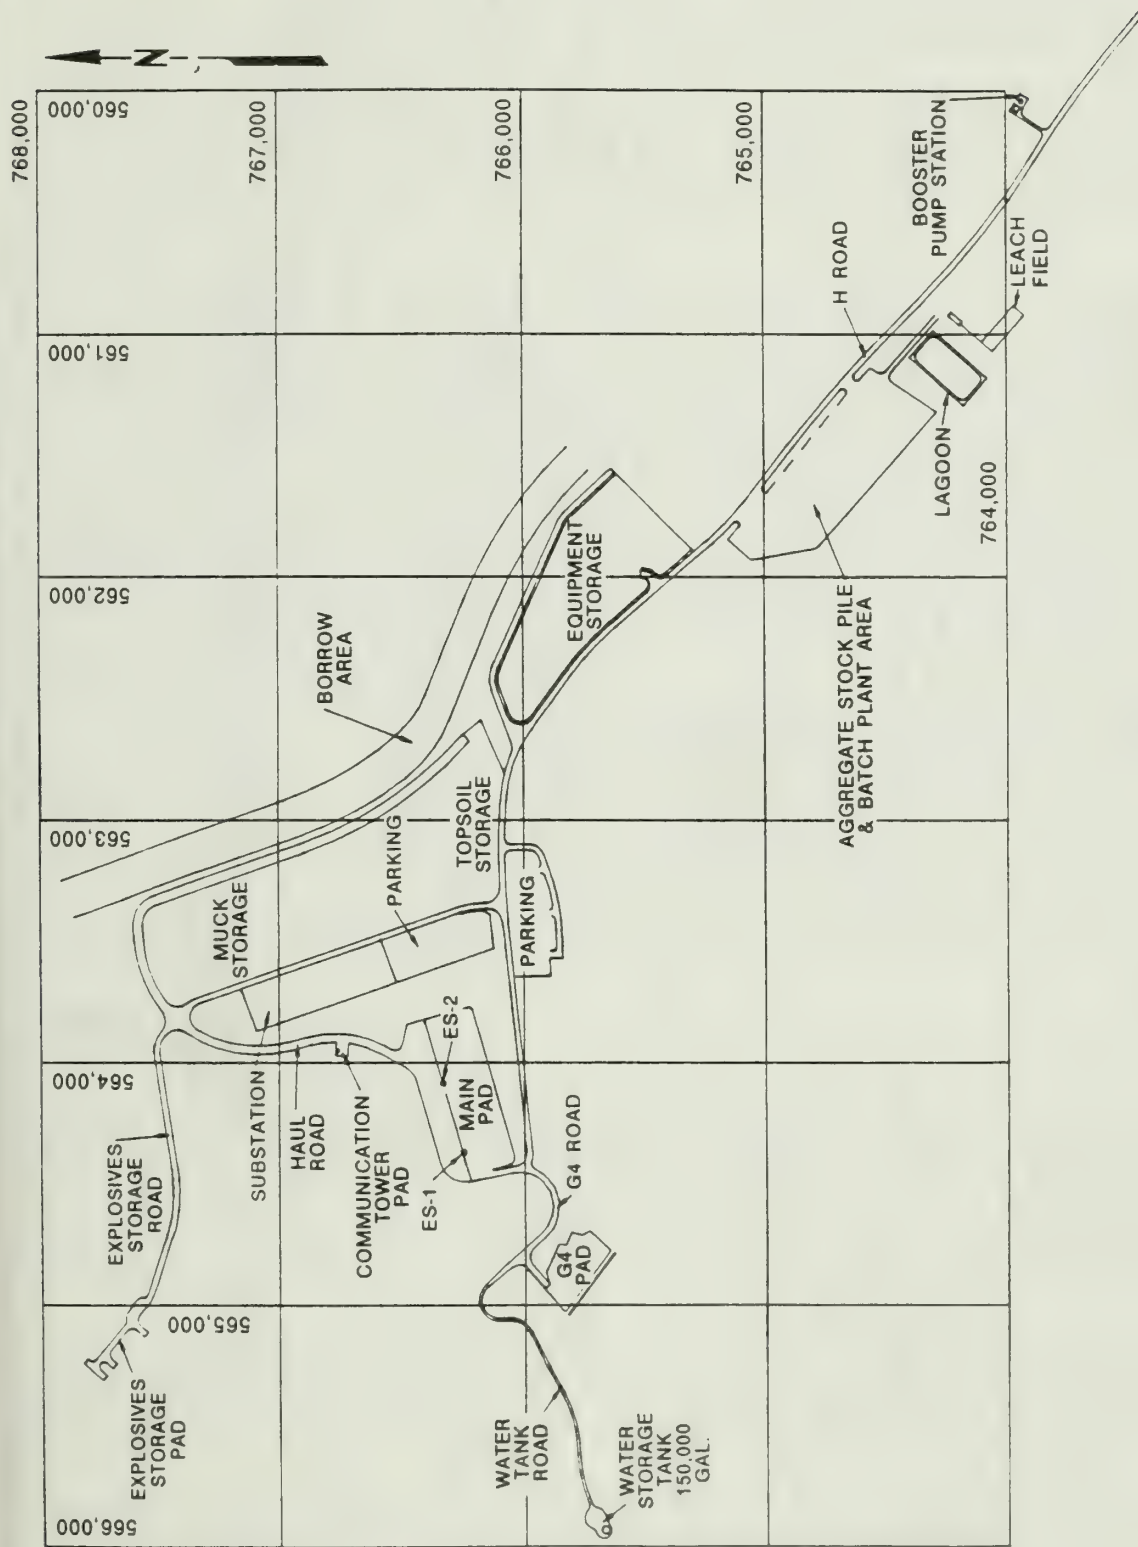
Exploratory shaft facility site plan. Modified from Title I design package (DOE, 1988).
